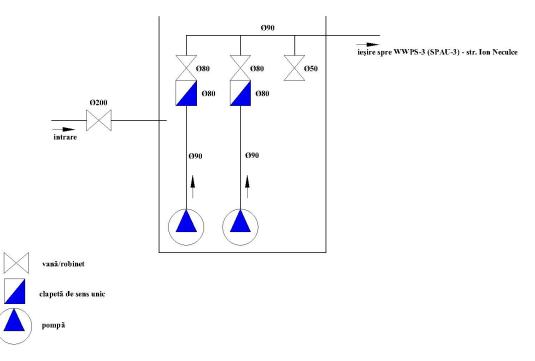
Hydraulic Scheme with existing equipment of WWPS-2 – Cetireni
